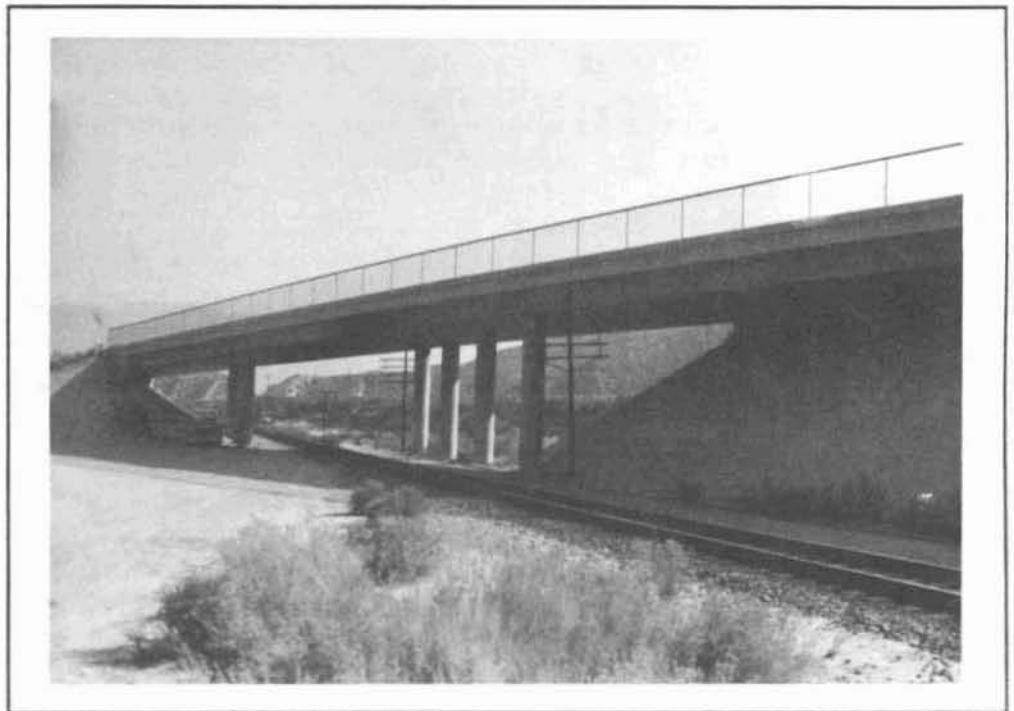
Highway 138 Bridge Over Railroad At Cajon Junction
